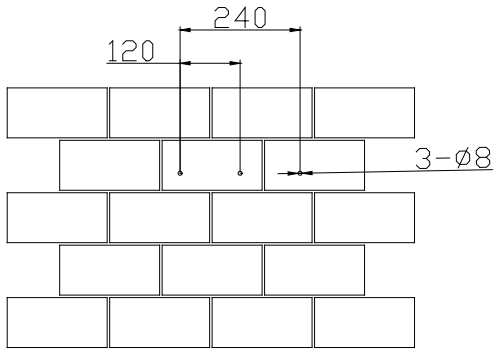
Drill hole dimensions of R5-7K/8K-S2
